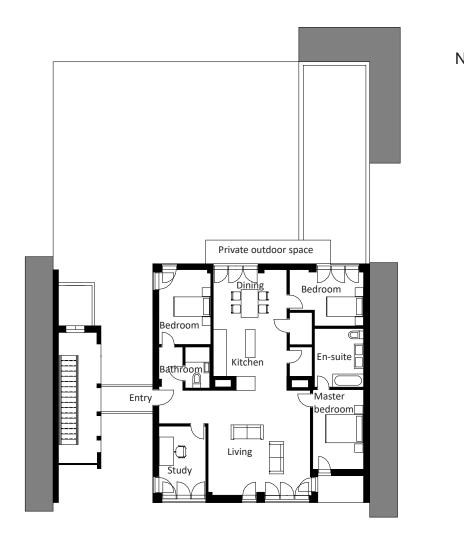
Floor plan of housing unit in E3 (scale 1:200)
